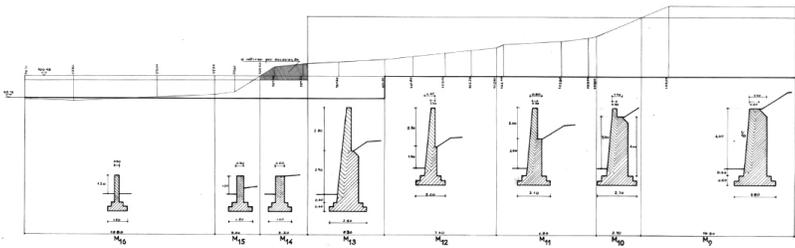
Municipal Market of Santa Maria da Feira; geometrical detailing of retaining walls © FIMS.
